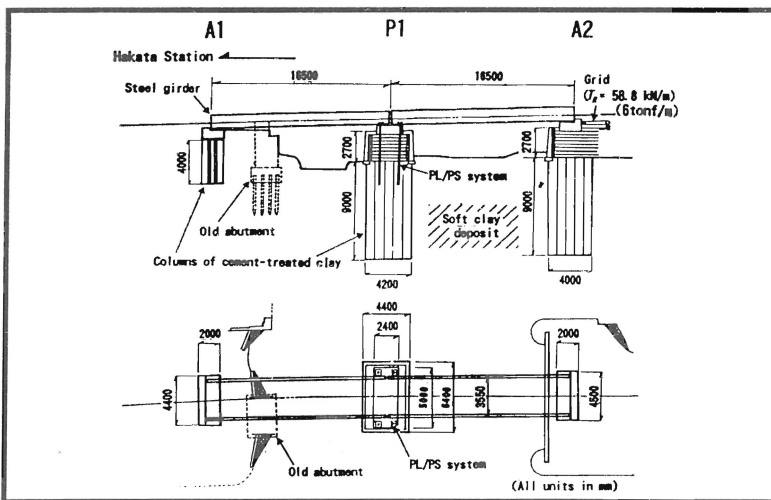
Two simple beam bridge girders for a single railway track, supported with a PLPS GRS pier and a GRS bridge abutment, Fukuoka City, Kyushu.
